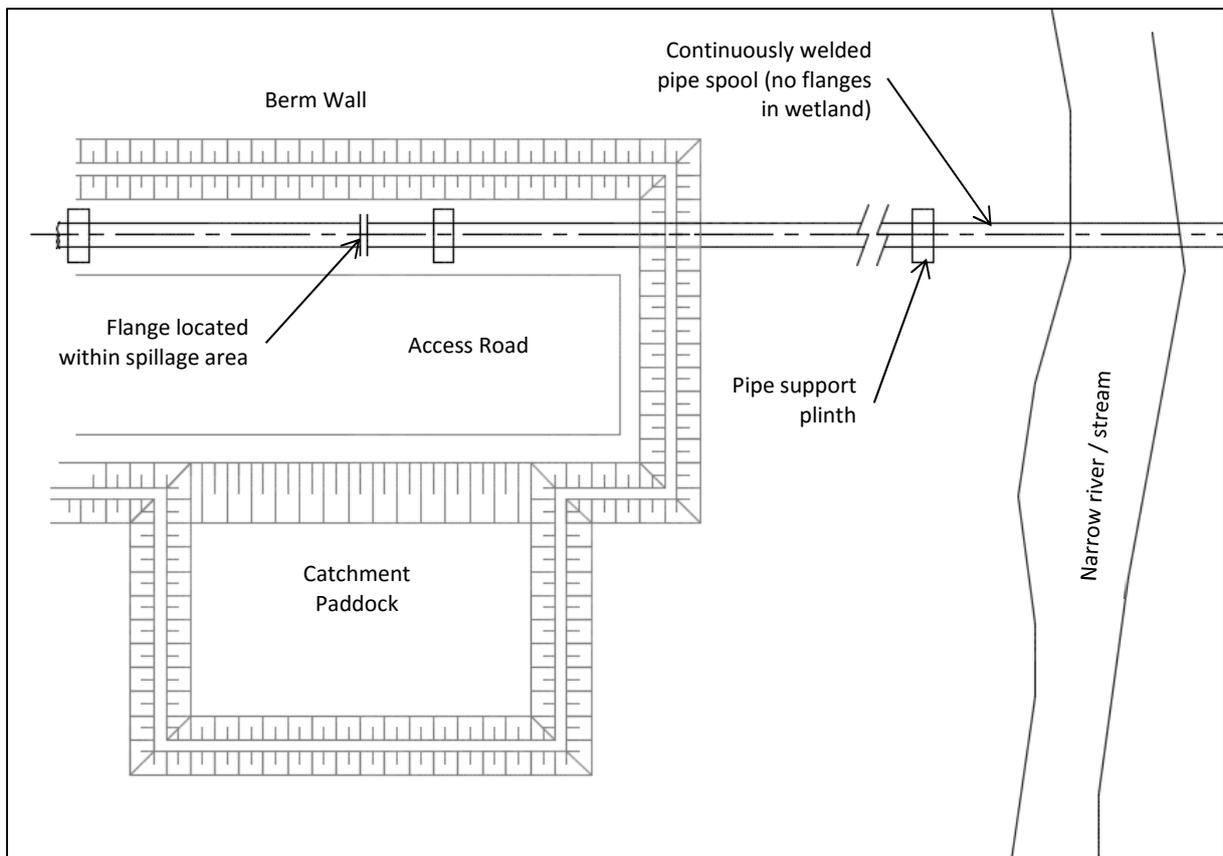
Class 2 River Crossing Spillage Paddock Plan View
